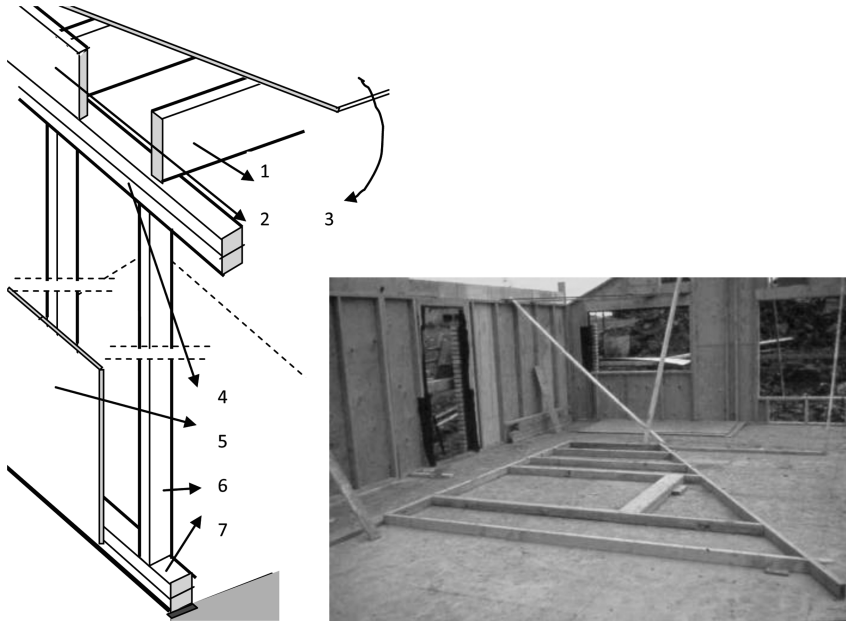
Platform type (1: joists, 2: header plate, 3: running surface, 4: top plates, 5: sheathing, 6: studs, 7: bottom plates).
